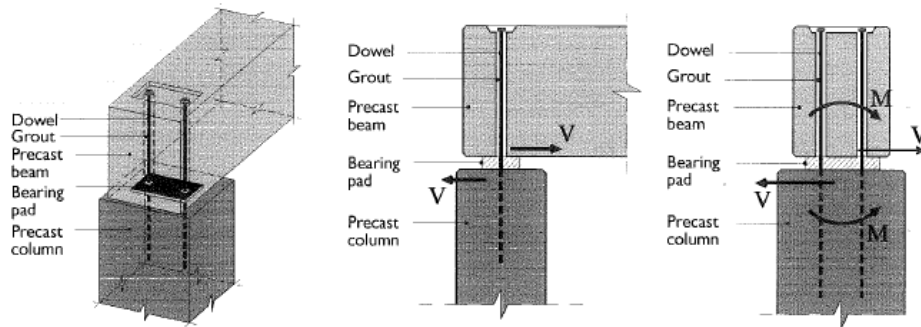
Typical hinged beam-to-column connection with parallel dowels (other reinforcements not shown for clarity)
